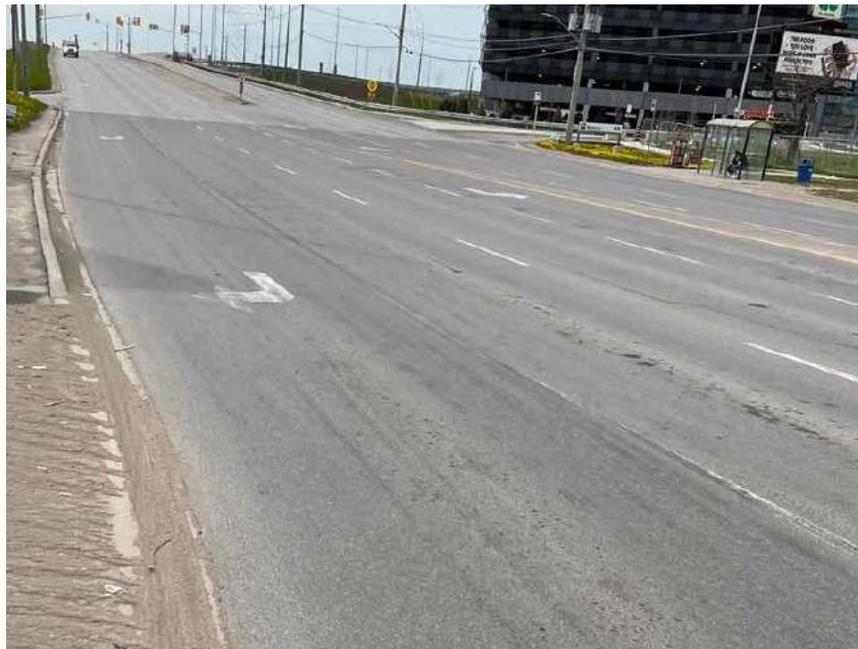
Bramalea Road, looking South, near the intersection of Bramalea Road and Oronda Road, showing slight to moderate longitudinal and transverse cracking associated with slight random cracking and slight pavement raveling.
